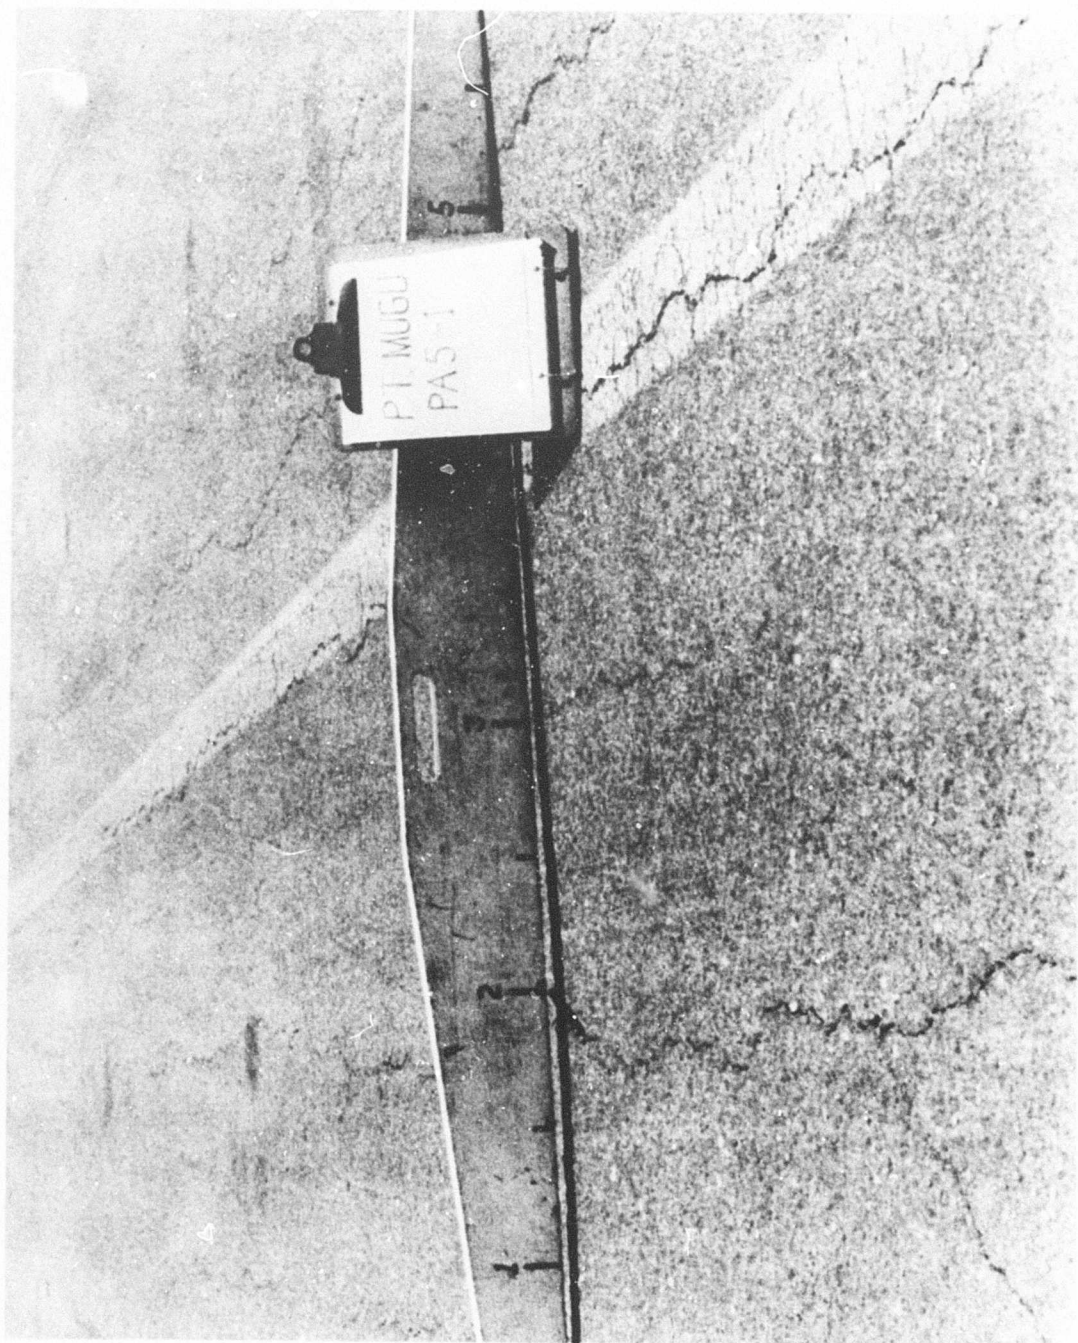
Rutting and pattern cracking, discrete area PA5-1.
